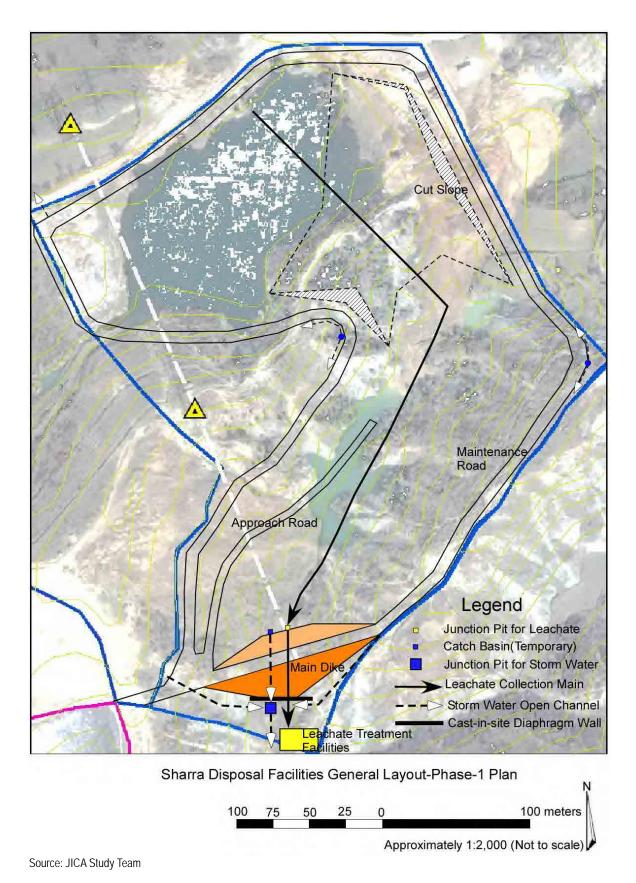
Sharra Waste Disposal Facilities General Layout Plan (Phase-1)
